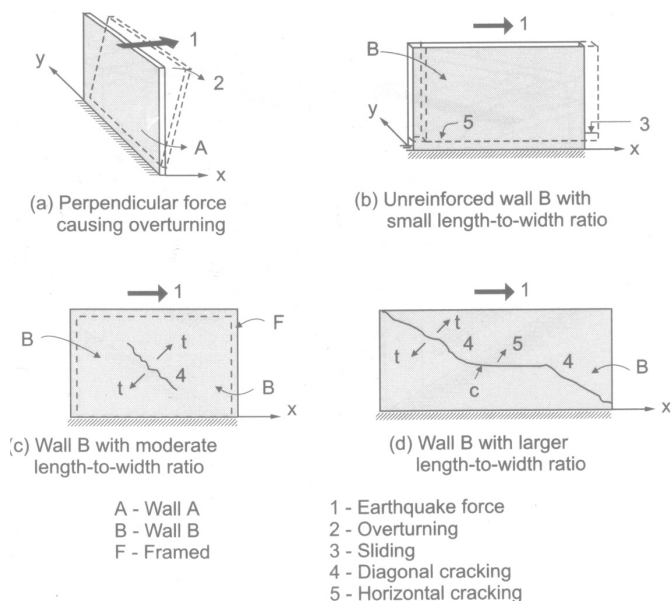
Examples of Damage Types in Masonry Bearing Walls
